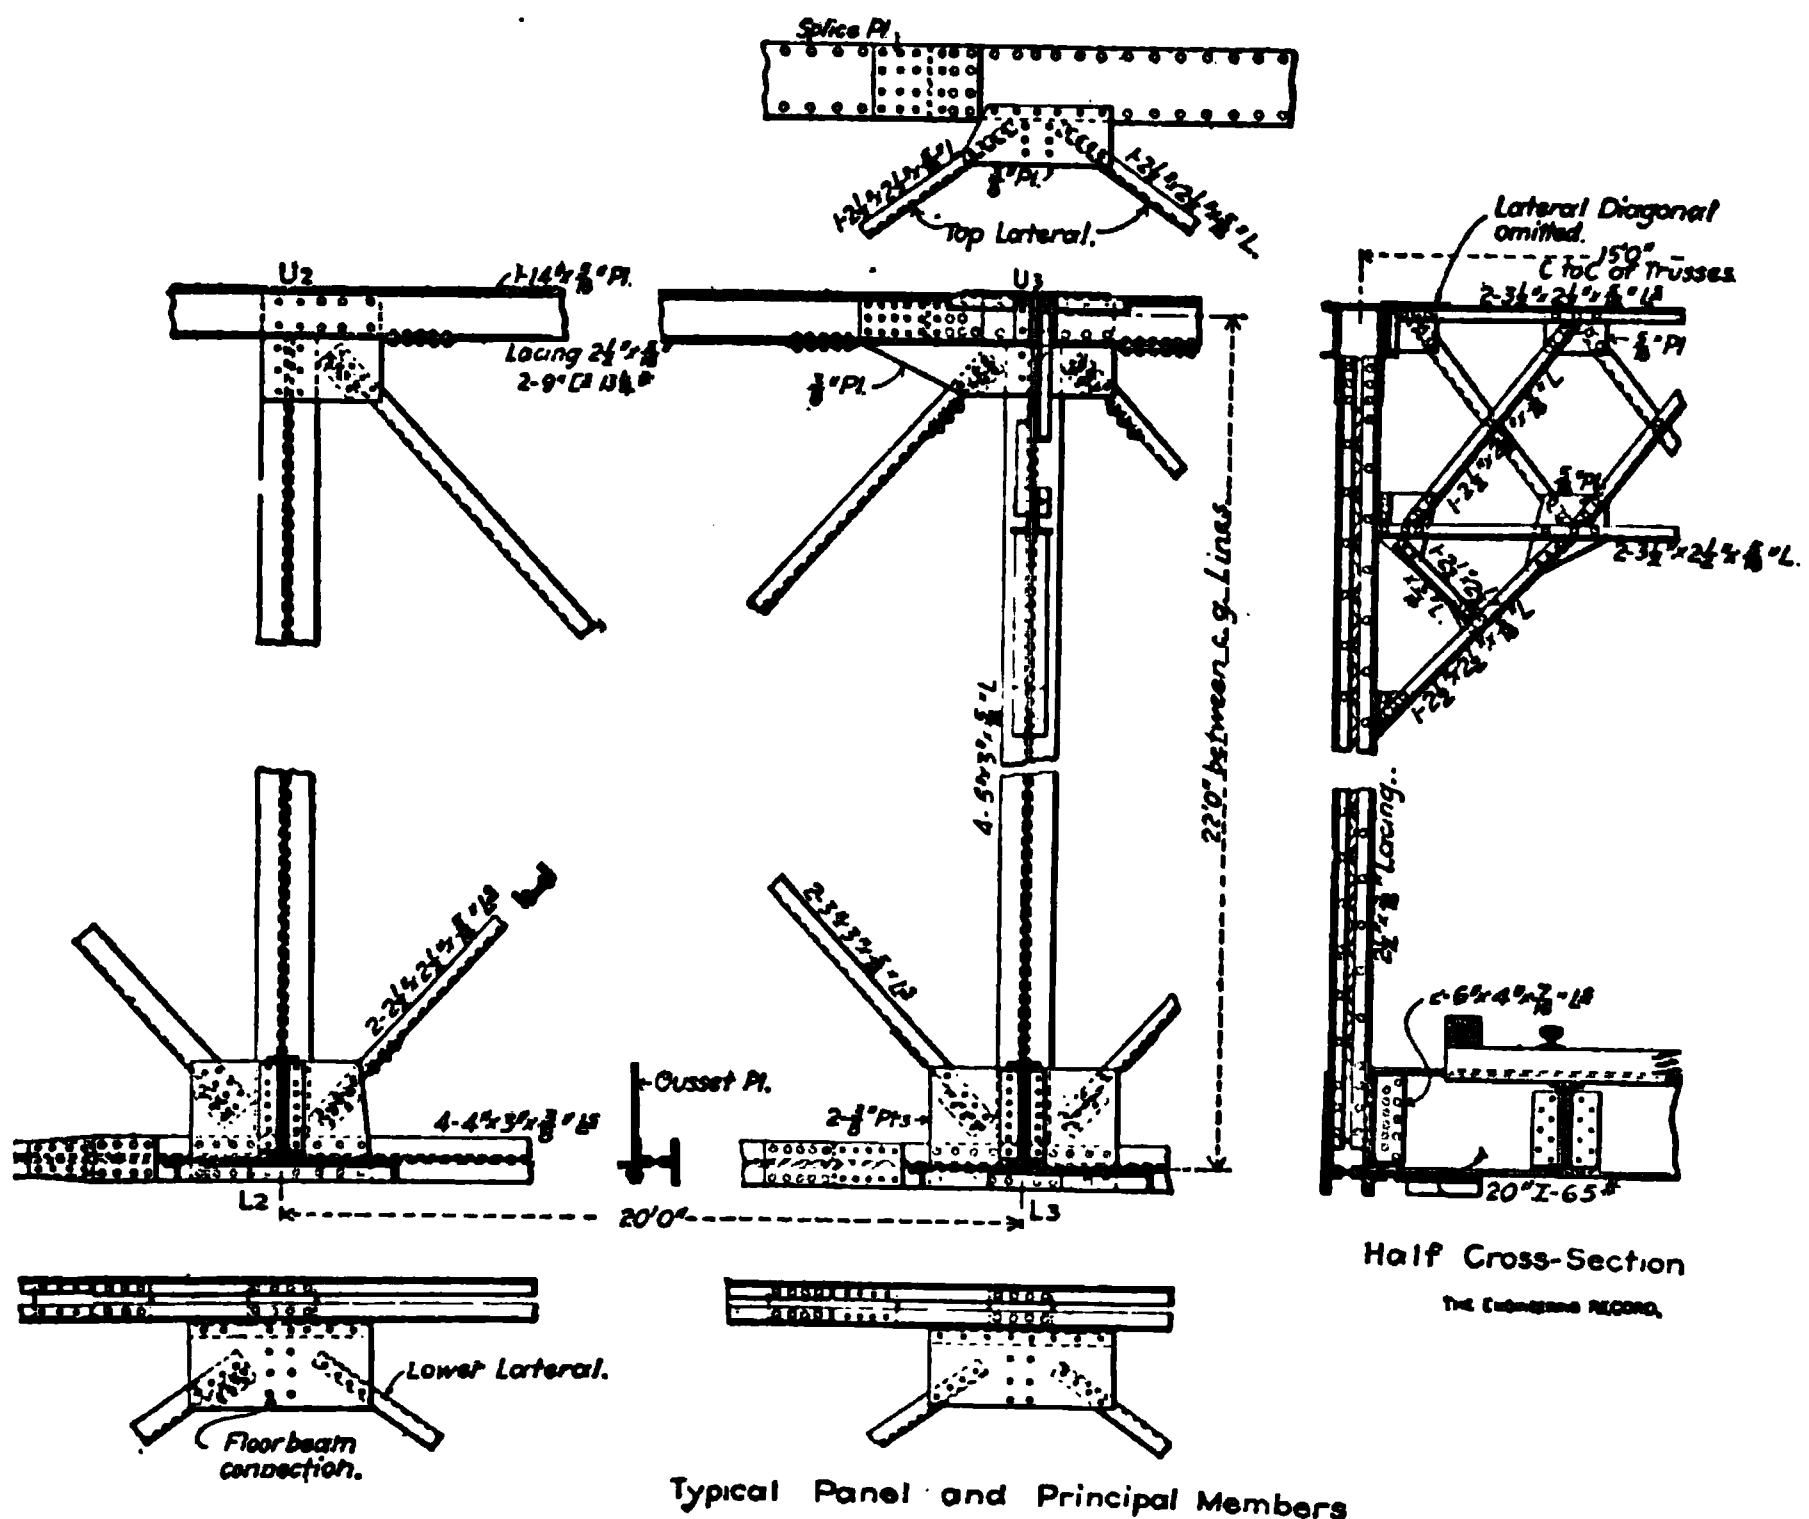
THROUGH RIVETED PRATT ELECTRIC RAILWAY BRIDGE.
